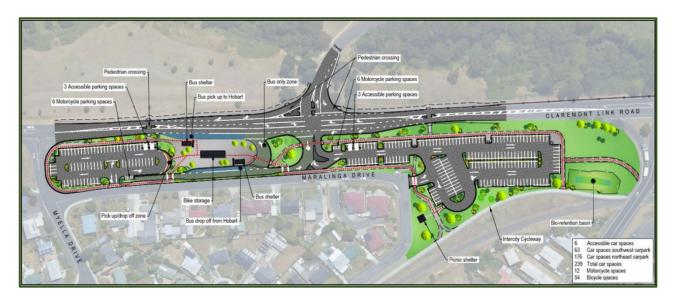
Park and ride facility image as submitted in the DA to the GCC by the department.
